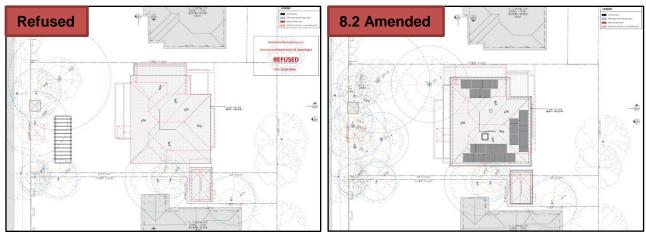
(left) & 8 (right). Refused and amended Roof Plan. Source: Refused and Amended Architectural Plans
